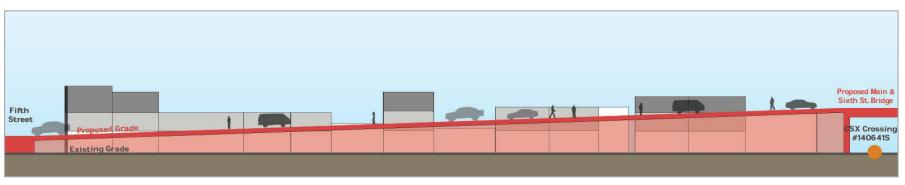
Alternative A Section/Elevation, south facing along 500 block of Main Street
